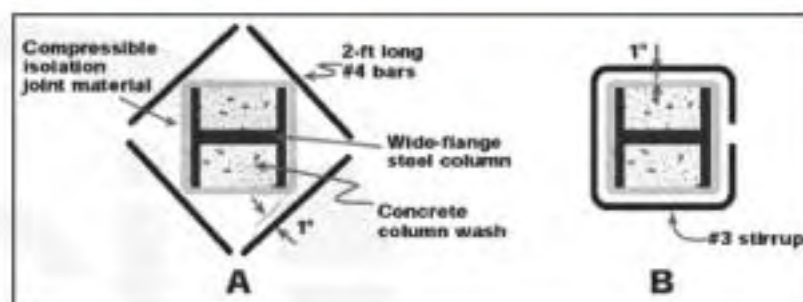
Eliminate the normal isolation-joint boxouts at wide-flange steel columns by wrapping the column with compressible materials and using 2 ft (0.6 m) lengths of No. 4 (No. 13) bars (A) to control cracking at the reentrant corners. To speed up steel placement at the columns, have the reinforcing bar supplier fabricate continuous No. 3 stirrups that workers can easily bend open to fit around the column (B). In either case, the steel should be positioned with a top-and-side clear cover of 1 in. (25 mm) (Holland and Walker 1998). (Note: 1 ft = 0.3 m; 1 in. = 25.4 mm.)
